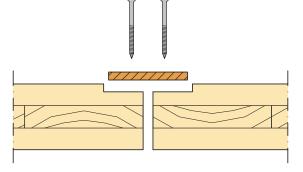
Floor - floor Source: Trada WIS 2/3-61; Redrawn by the author
